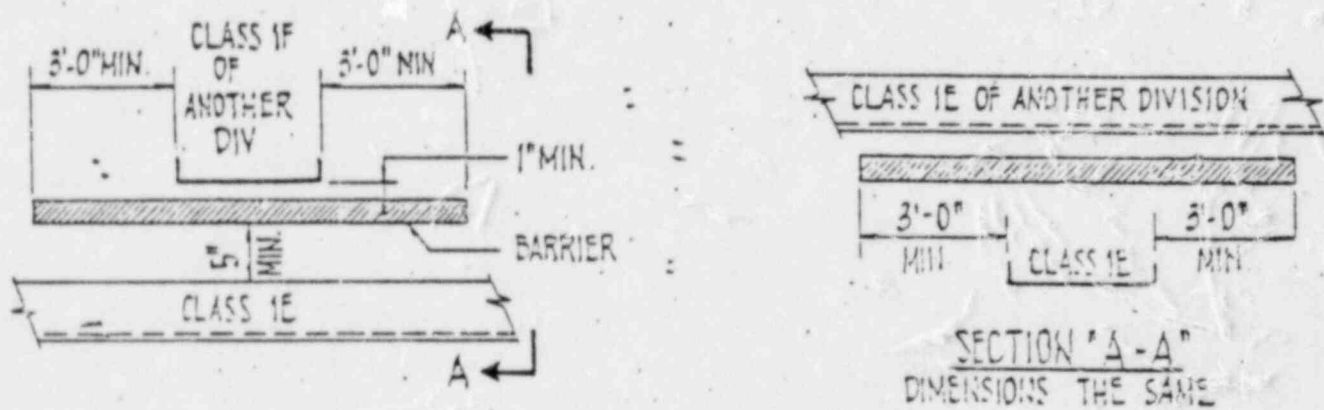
ARRANGEMENT FOR CLASS 1E CABLE TRAY CROSSINGS
